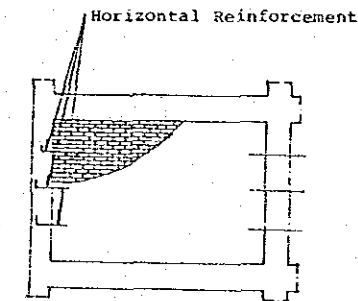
DETAIL OF CONCRETE HOLLOW BLOCK
